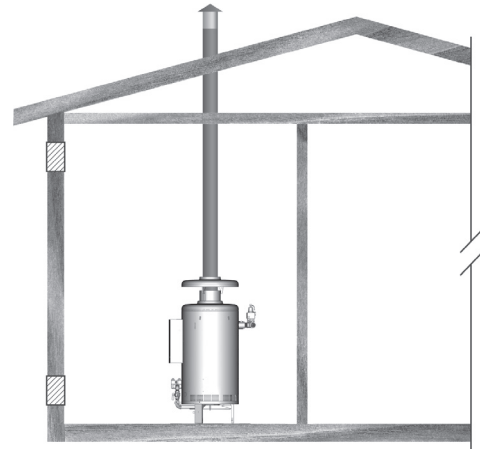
OUTDOOR AIR THROUGH TWO OPENINGS
